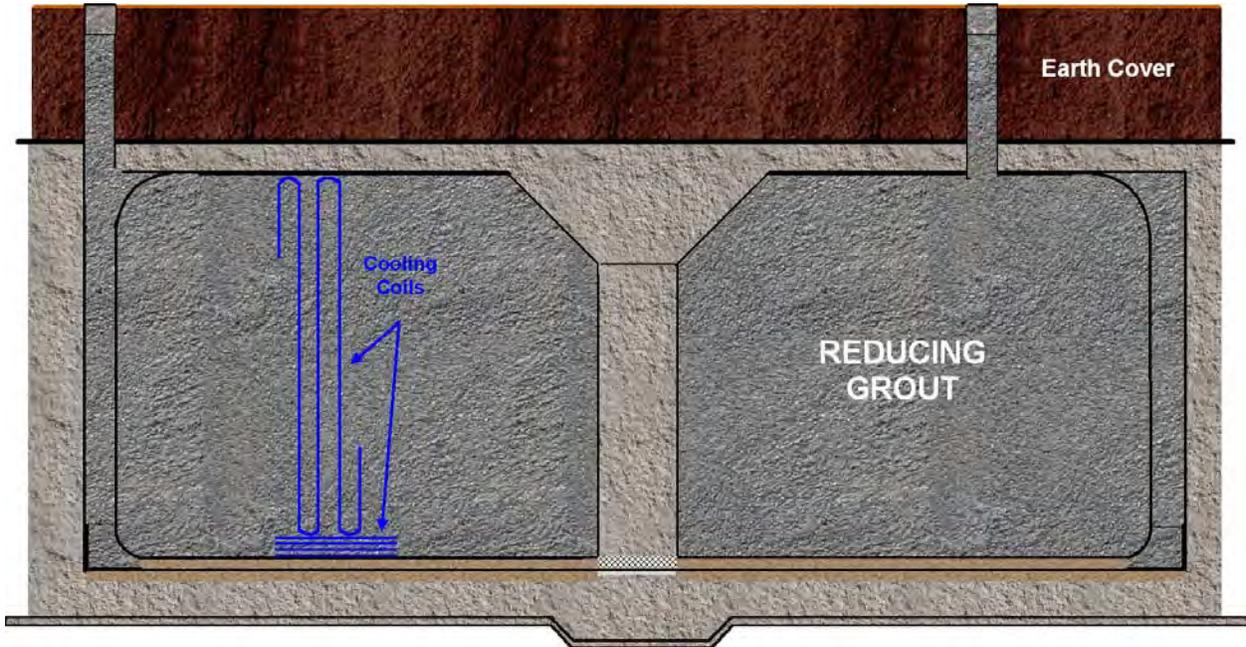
Typical Type III Tank Grouting Configuration
